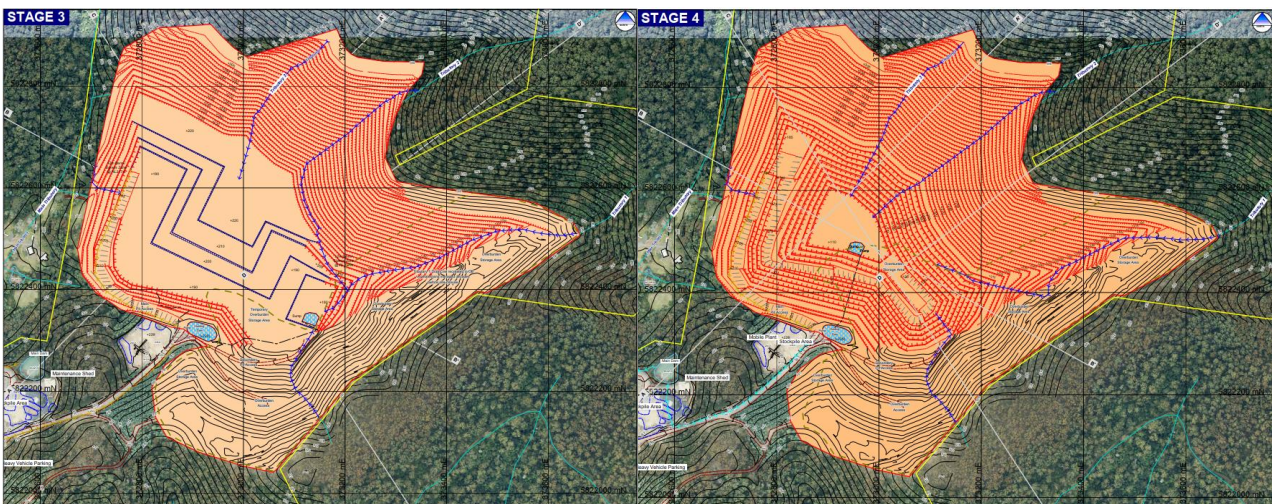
Stage 3 of expansion - Site Layout Plan (Source: BCA)
